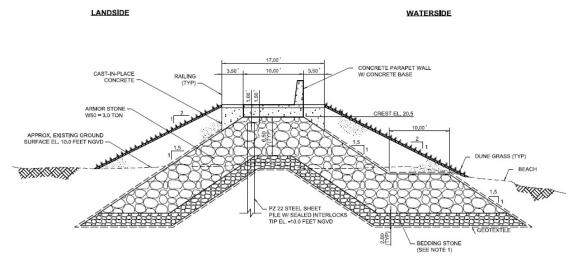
Concrete Parapet Wall atop Buried Seawall
